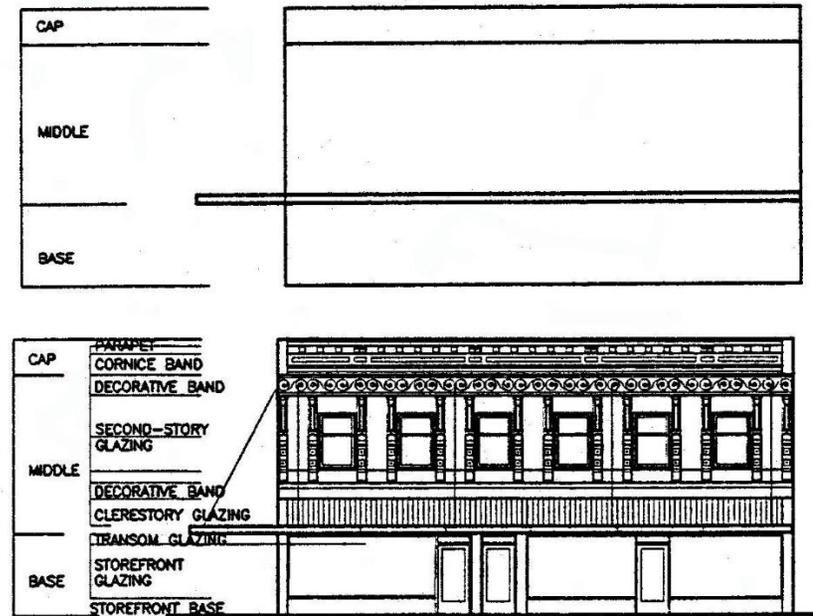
Above, an abstract illustration of required horizontal divisions. Below, an existing example.
